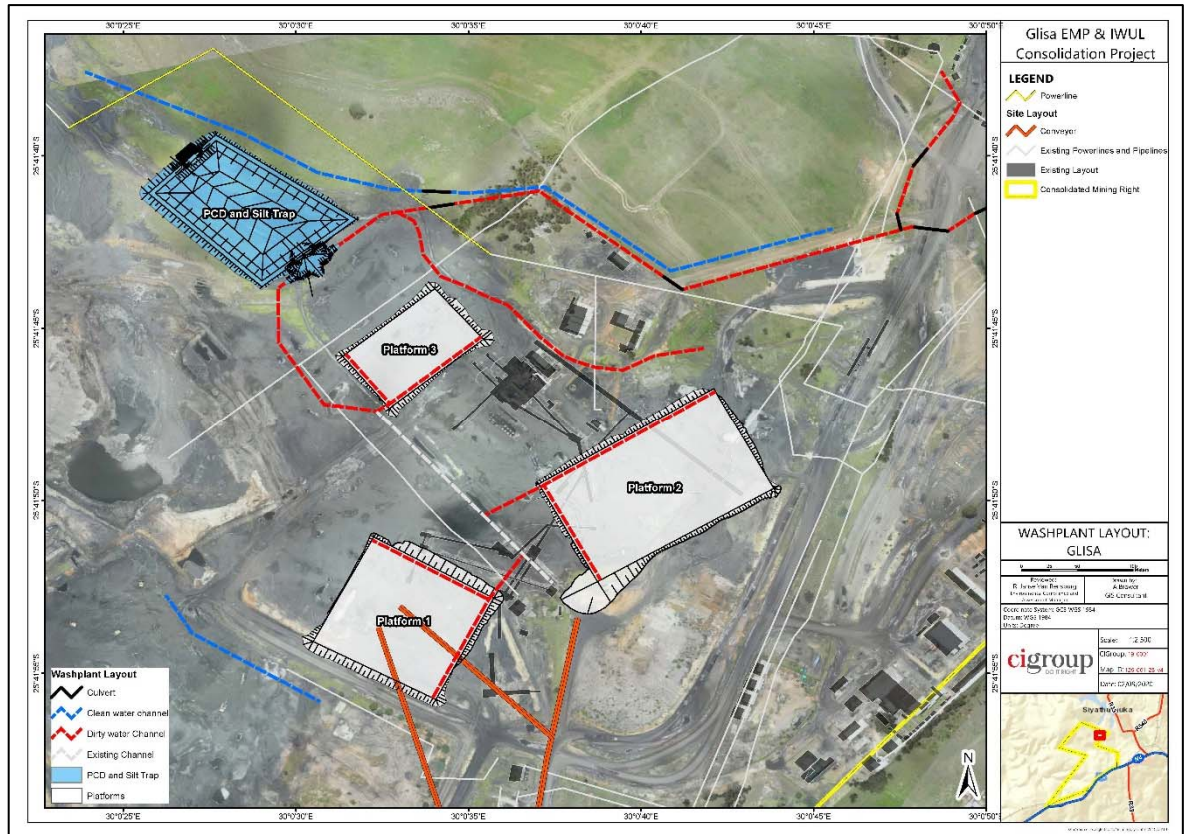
Proposed Site Layout around the Glisa Section CSWP.
